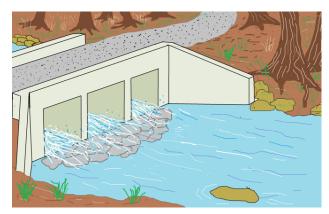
Illustration of Streambed Armoring at Culvert Exit
